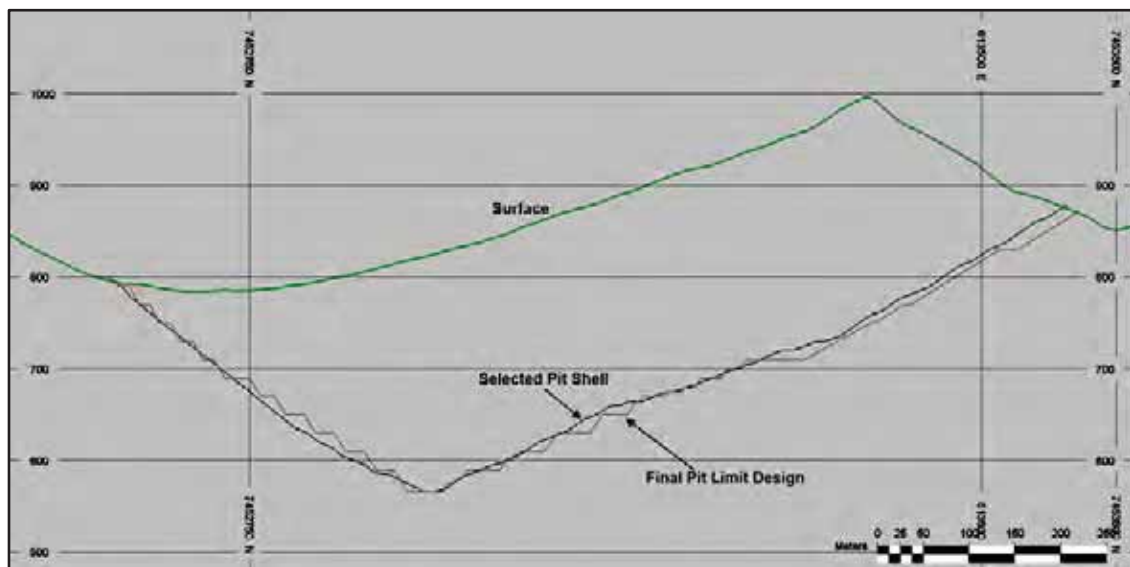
Section 2 Showing Mine Design and Selected Pit Shell (looking north-west) (Wood, 2020)
